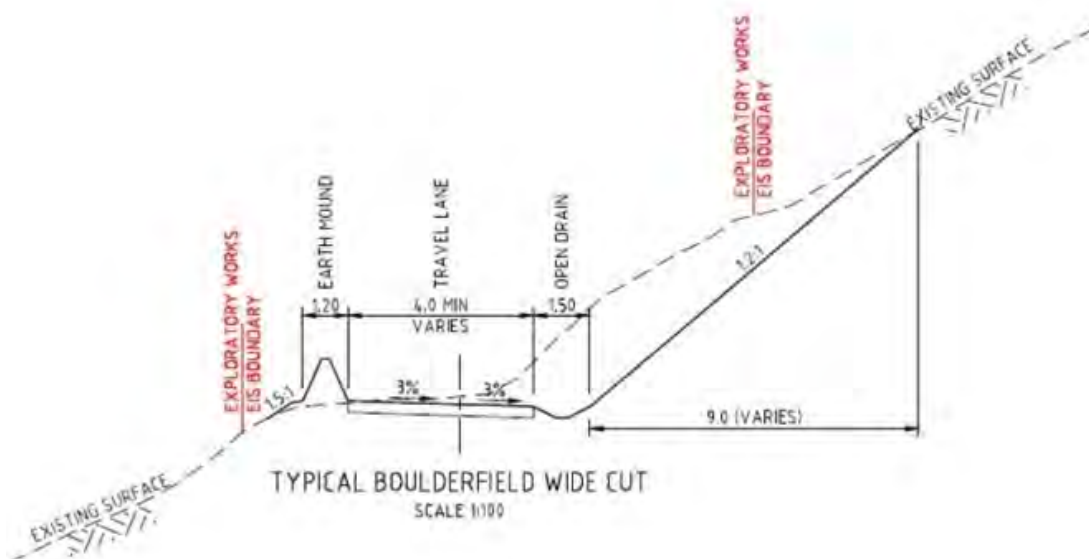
Proposed road design for the block streams sections. (Source: Snowy Hydro Ltd)
